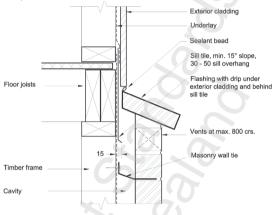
Flashing details – Veneer (continued on page 30)
